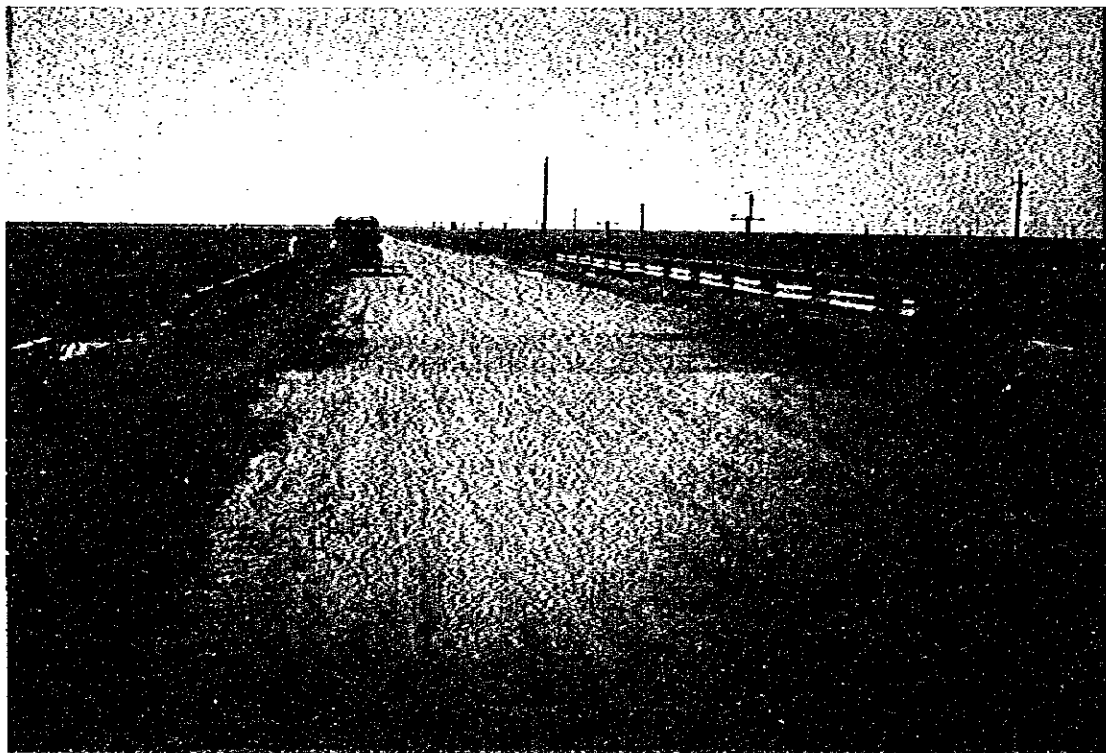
Republican Road and Bridge No. 4 (Atyrau to Mahambet)
